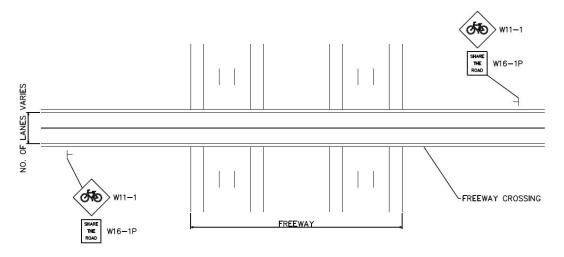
Plan View of Bicycle Warning Added to Existing Crossing
